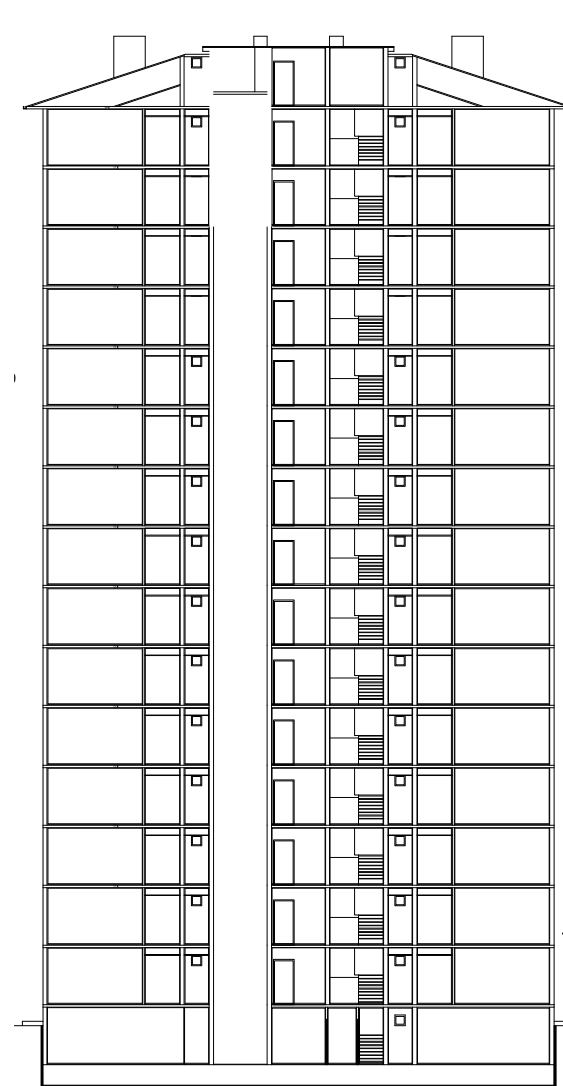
Section of a building with 100m<sup>2</sup> dwellings
